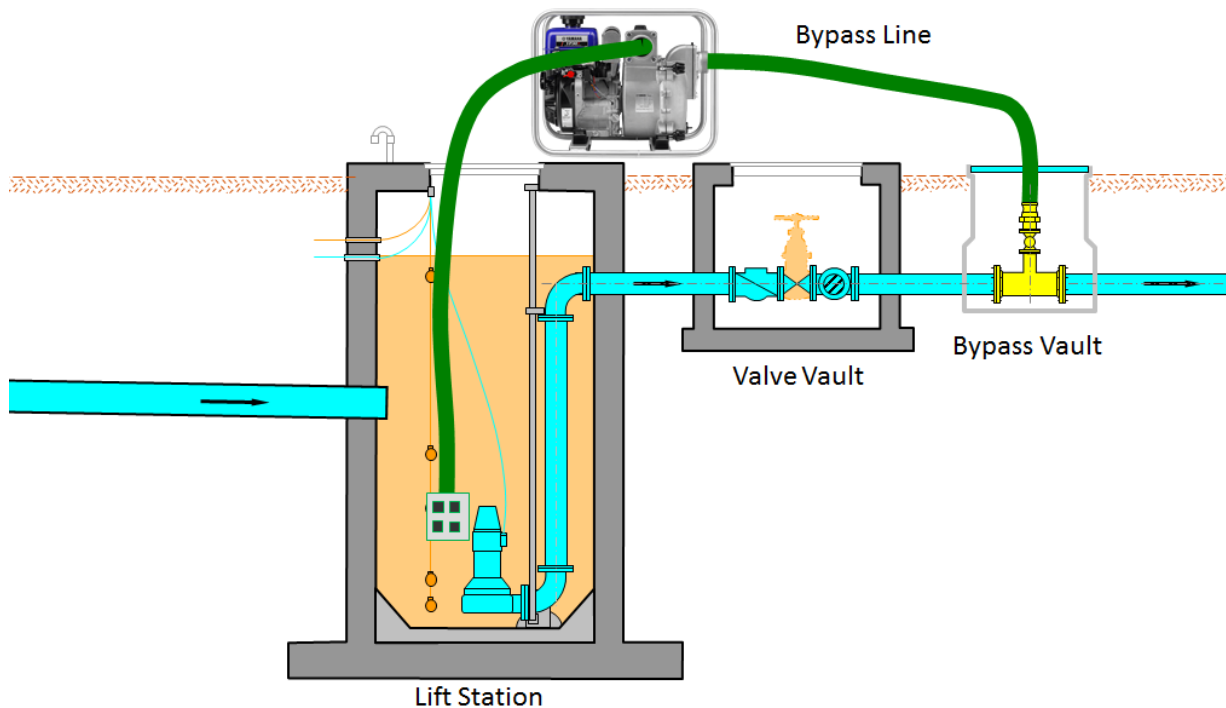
~ Lift Station Bypass Pump and Piping Arrangement
